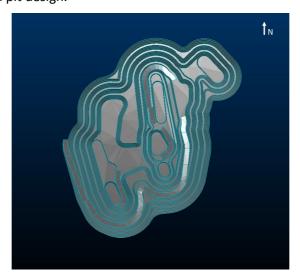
Aphrodite Open Pit Mine Design (Plan View
